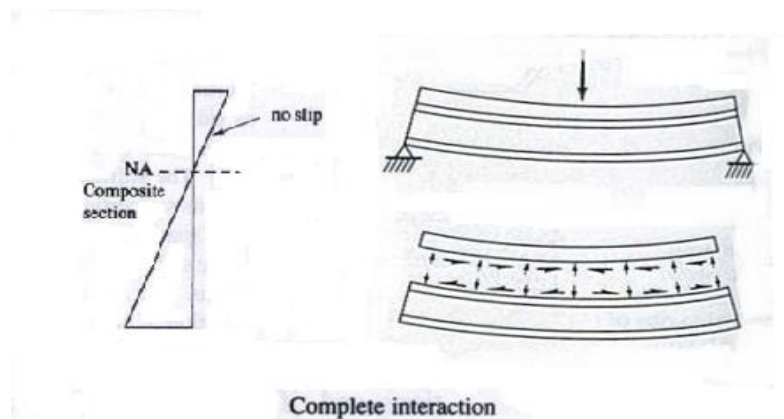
1 Fully Composite Action of composite Steel-Concrete beam
